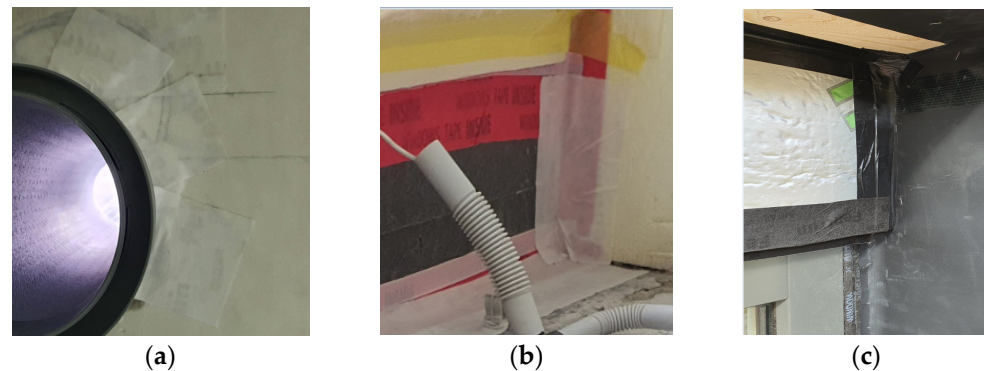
Application of self-adhesive tapes to wall and vents (a); window and foundation (b); wall and window/wall and roof (c).
